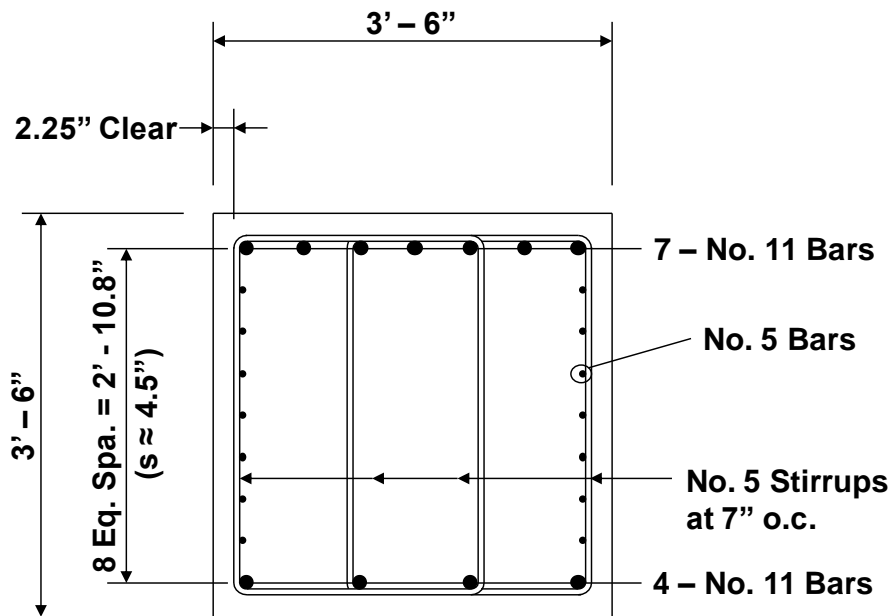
Reinforcement details – elevation (design per proposed STM specifications)
